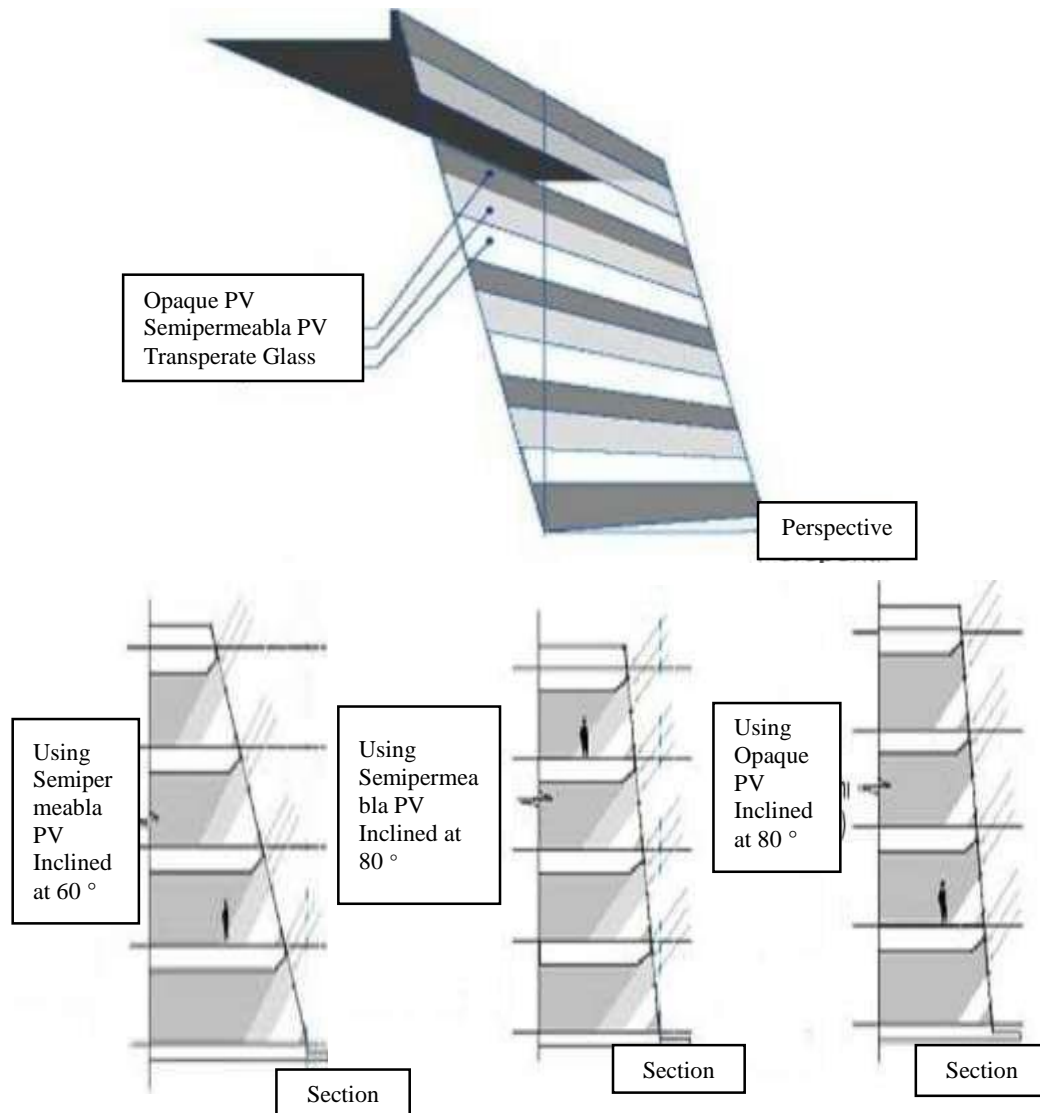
Usage of PV module in inclined planar curtain wall (Sayın, 2006)
